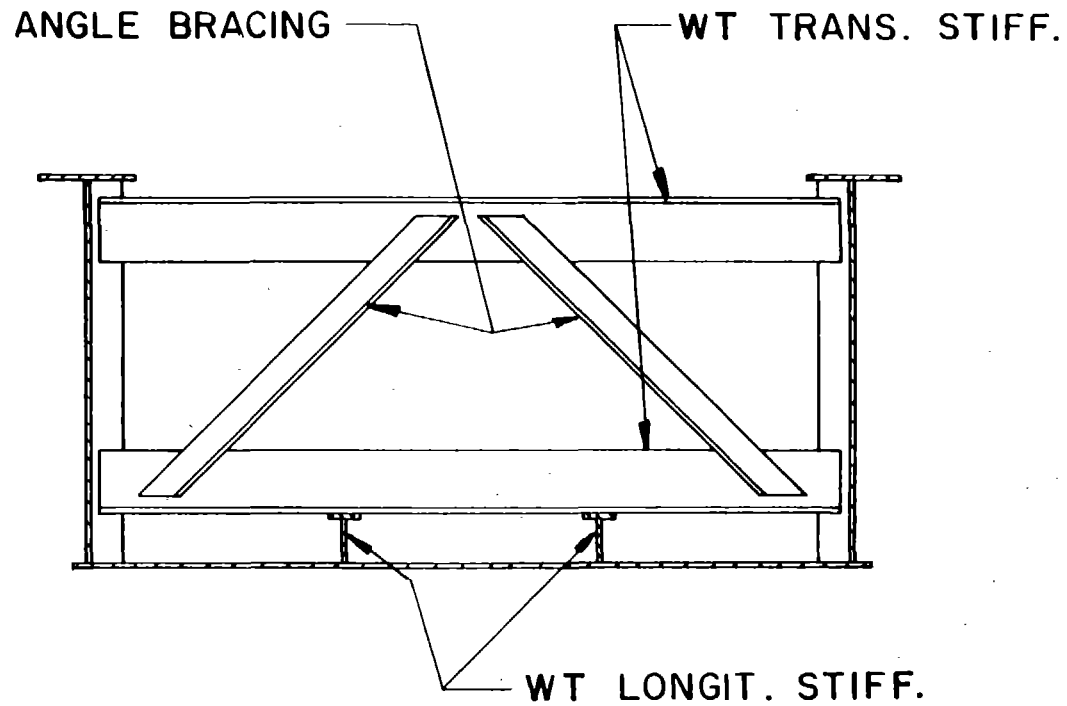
TYPICAL CROSS SECTION — AASHTO DESIGN
